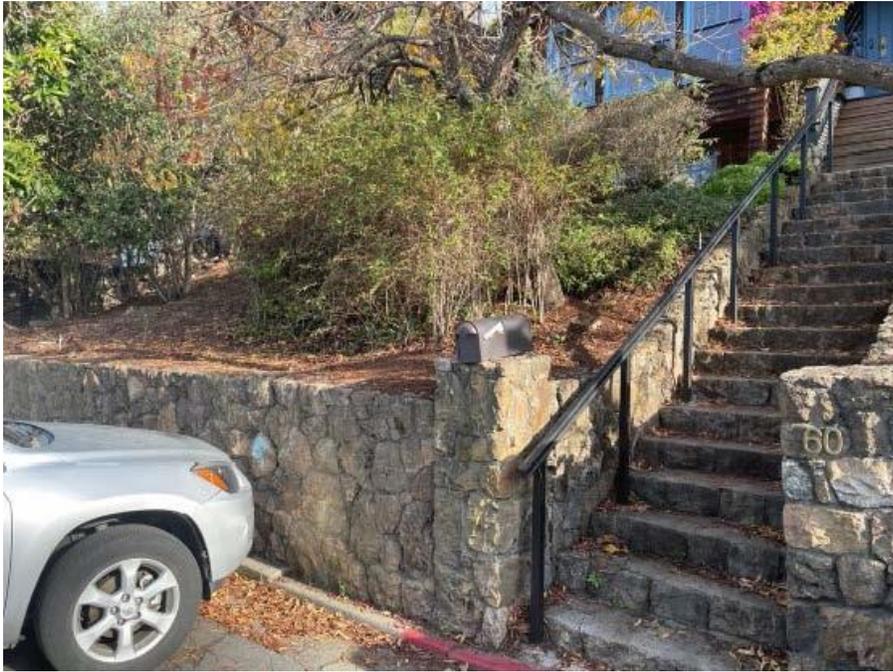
Rhyolite stone retaining walls at the front (west) of the property
